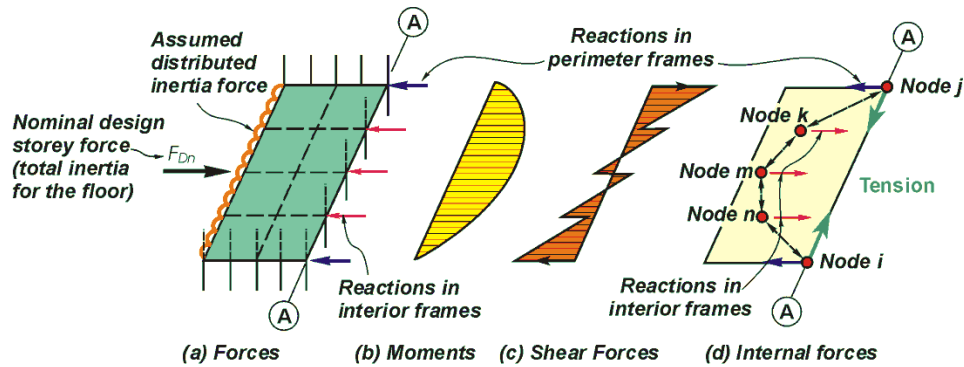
Deep beam analogy for a typical concrete diaphragm with a frame structure (modified from Park et al. (1997) by Des Bull)
